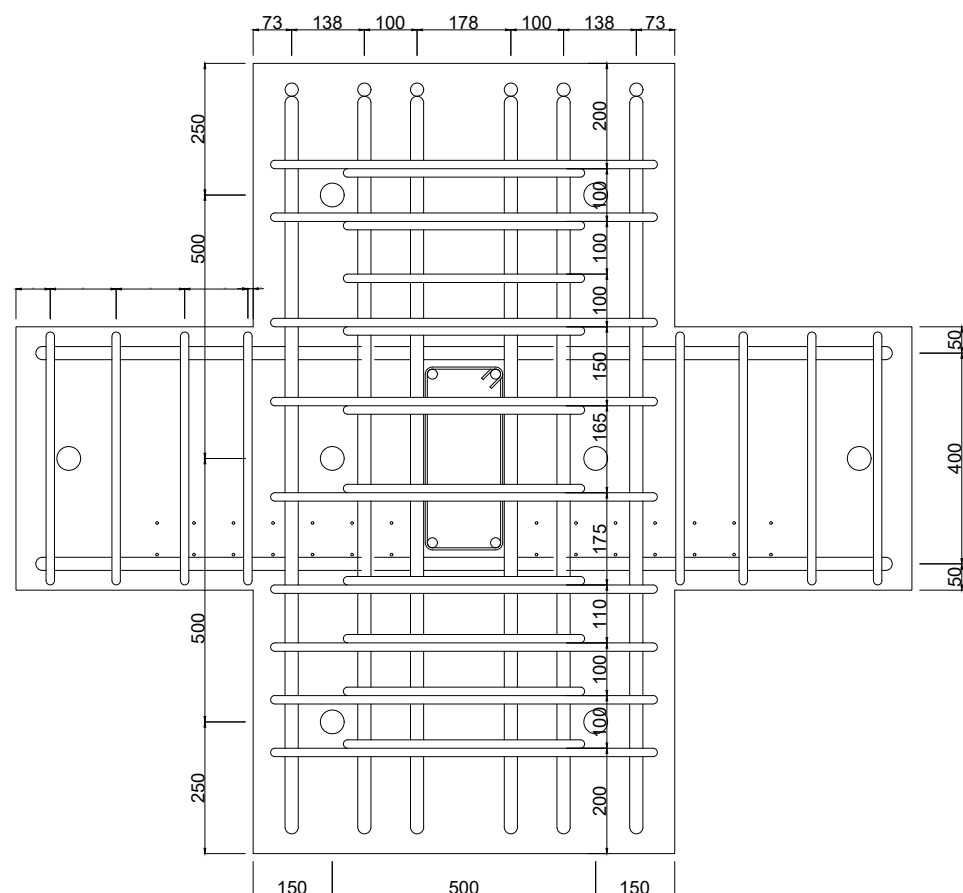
Dimensions and reinforcement details of SP-S6-Slab K
